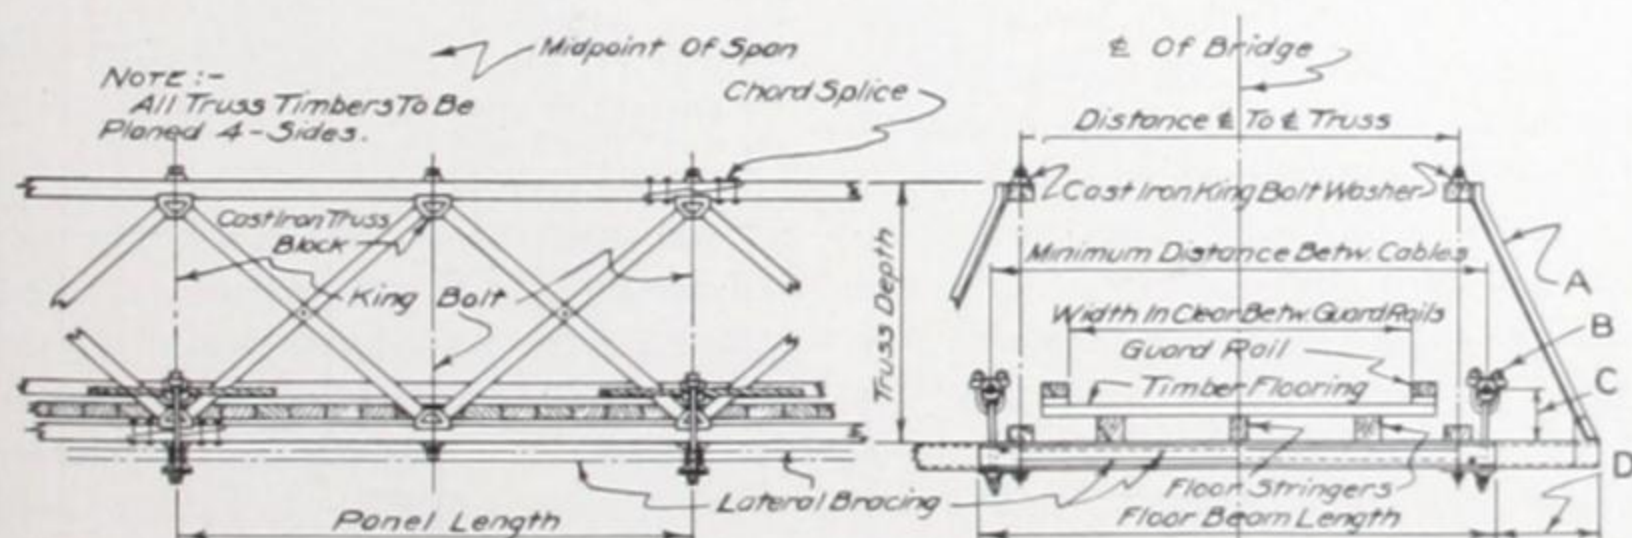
Section of Light Suspension Bridge or Walkway a. Wind Bracing Angle at Every Third Floor Beam. b. Cable Clamp. c 12 in. (Minimum.) d. Extension of Floor Beam Channel for Wind Bracing Angle Connection
